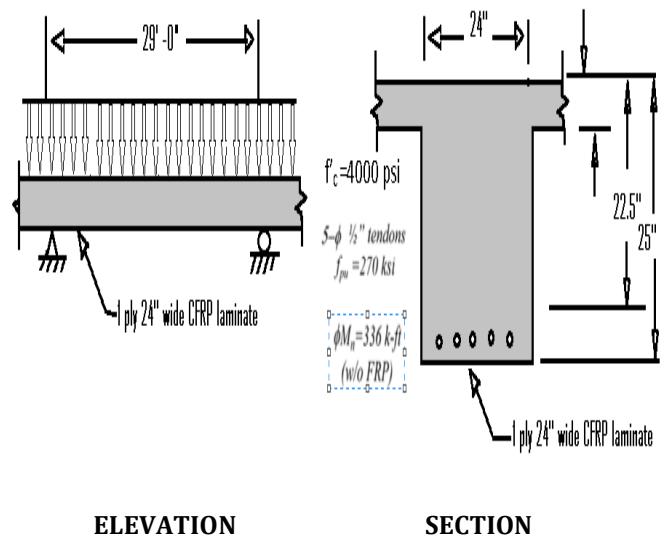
Post tensioned Prestressed concrete T beam with FRP wrapping at base.
